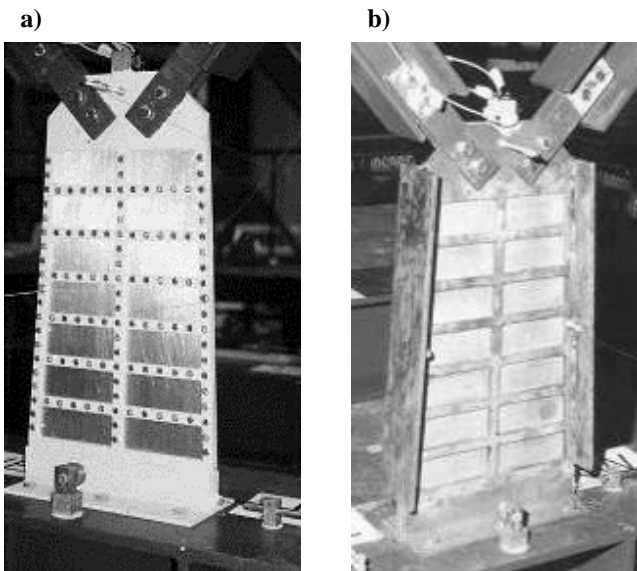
a) The bolted panel and b) brazed panel on the frame for shaking-table tests.
